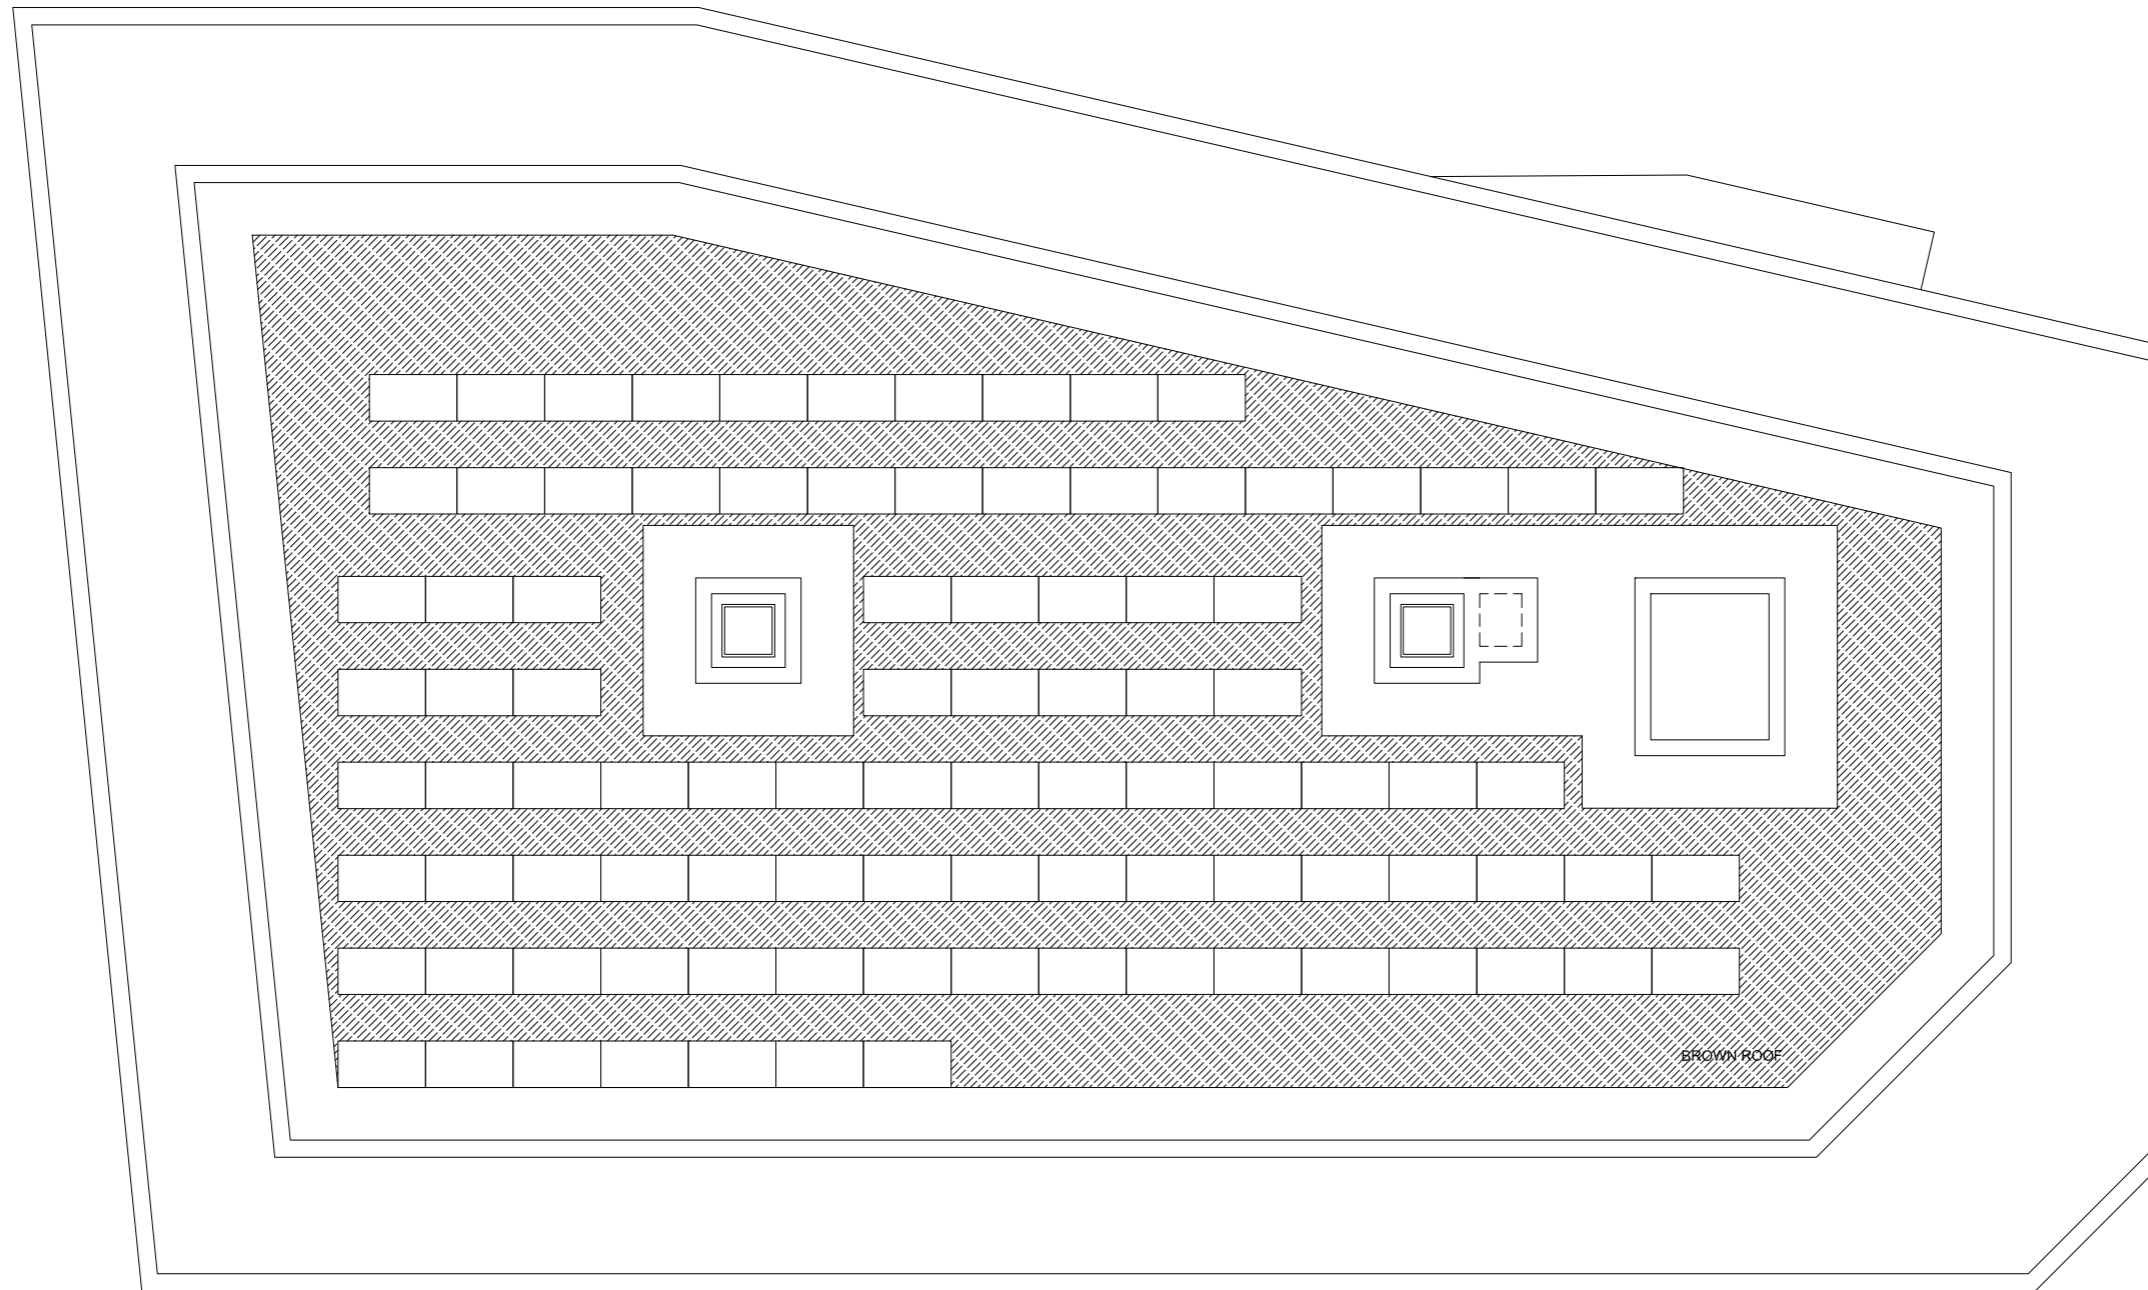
OVERVIEW OF THE PV ARRANGEMENT ON THE WORKSPACE BUILDING
